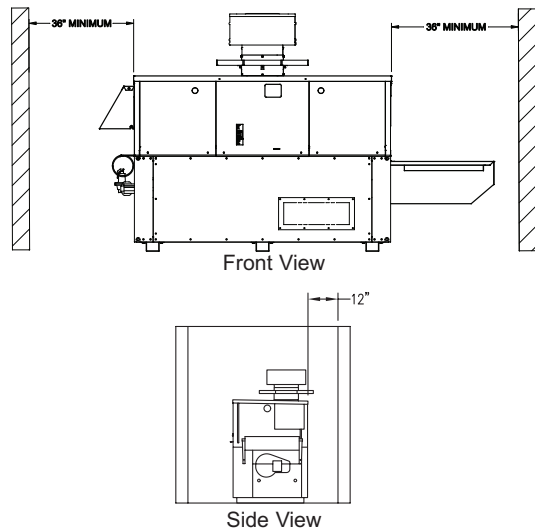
Minimum Clearances from Combustible Surfaces – Outdoor Installations
